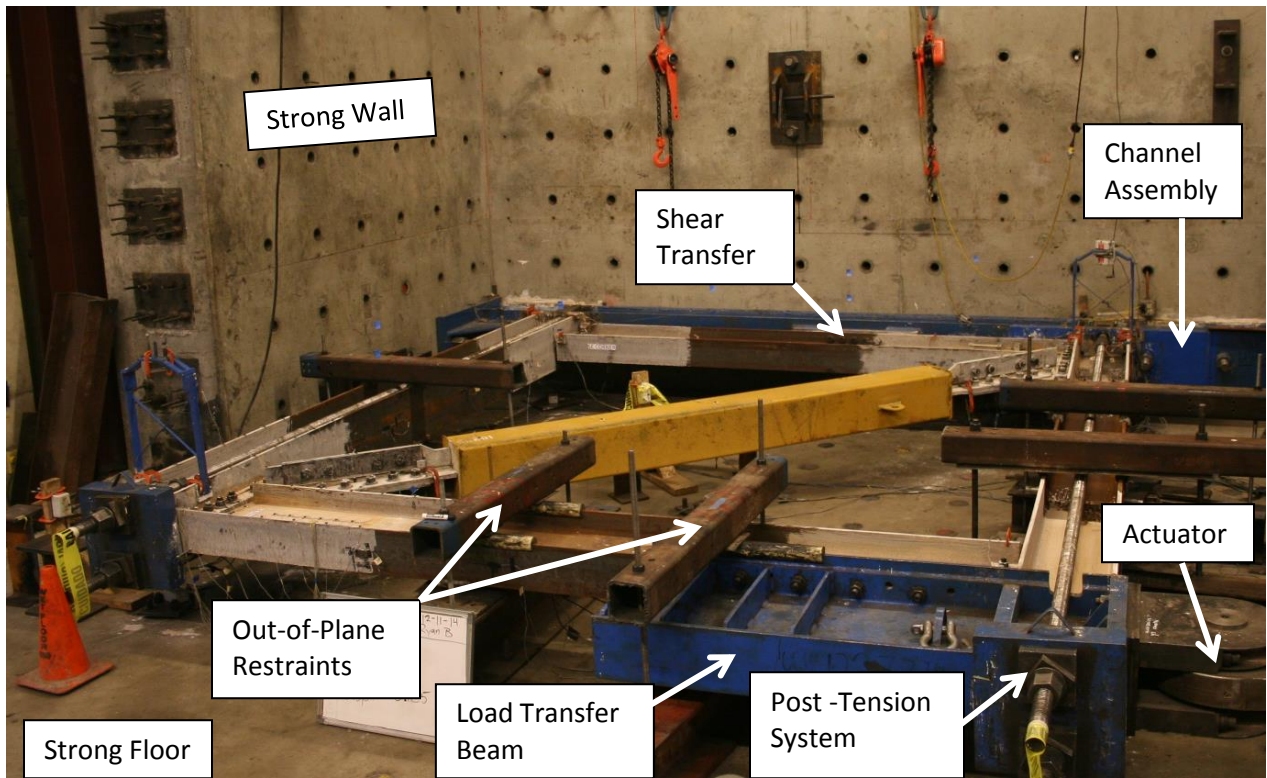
Picture of Experimental Setup (Specimen NCBF2-R1)
